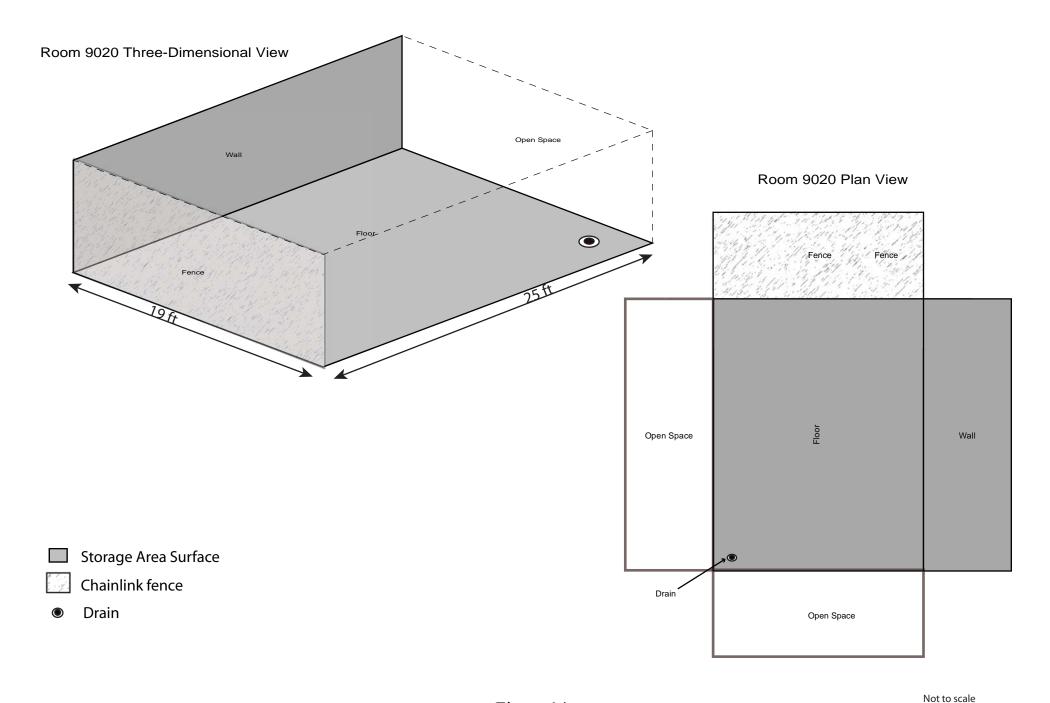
Technical Area (TA) 3, Building 29, Portion of Room 9020
